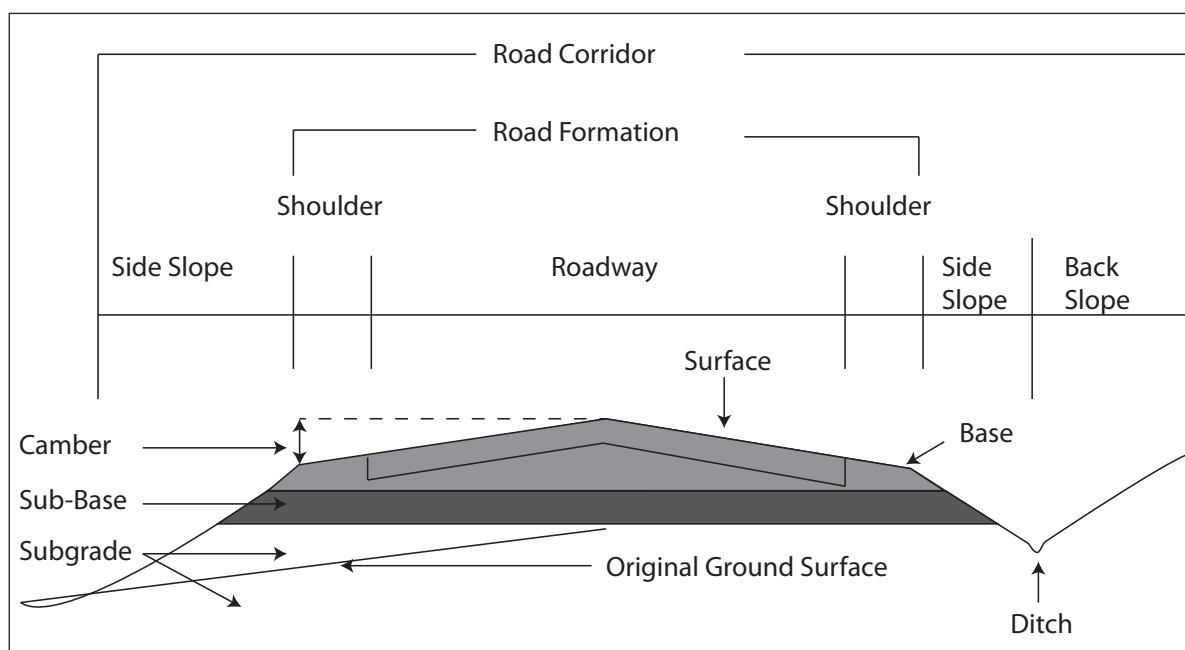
Typical Road Cross Section (Source: FAO, 1977)
